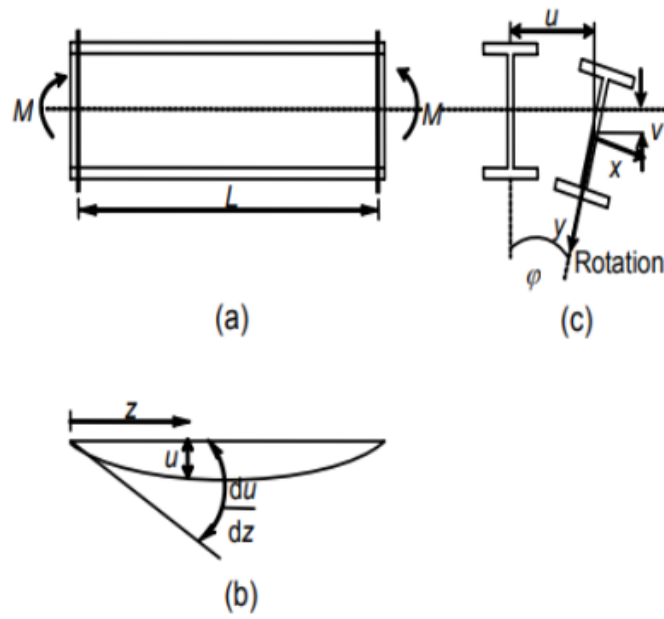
LTB in I-Beam (a) Elevation, (b) longitudinal axis plan and (c) Cross-Section
